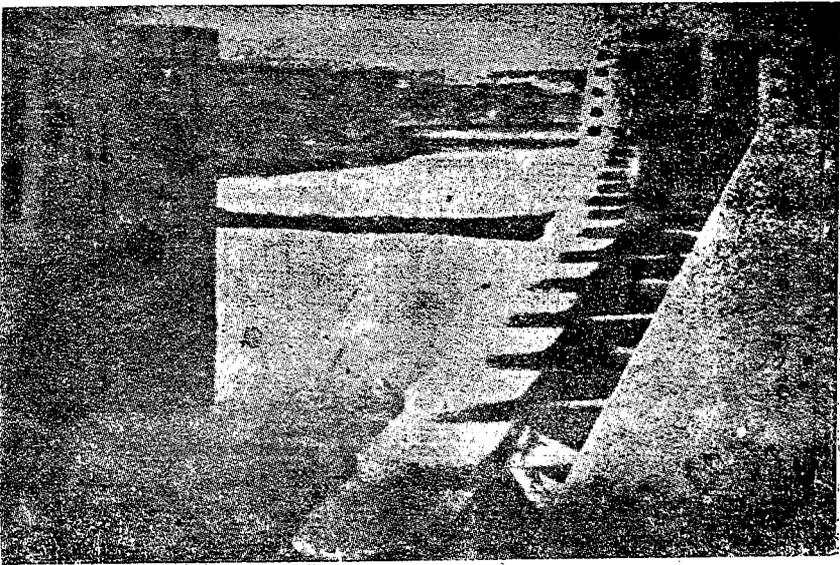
Photographic view of a fish ladder provided in the divide wall.
